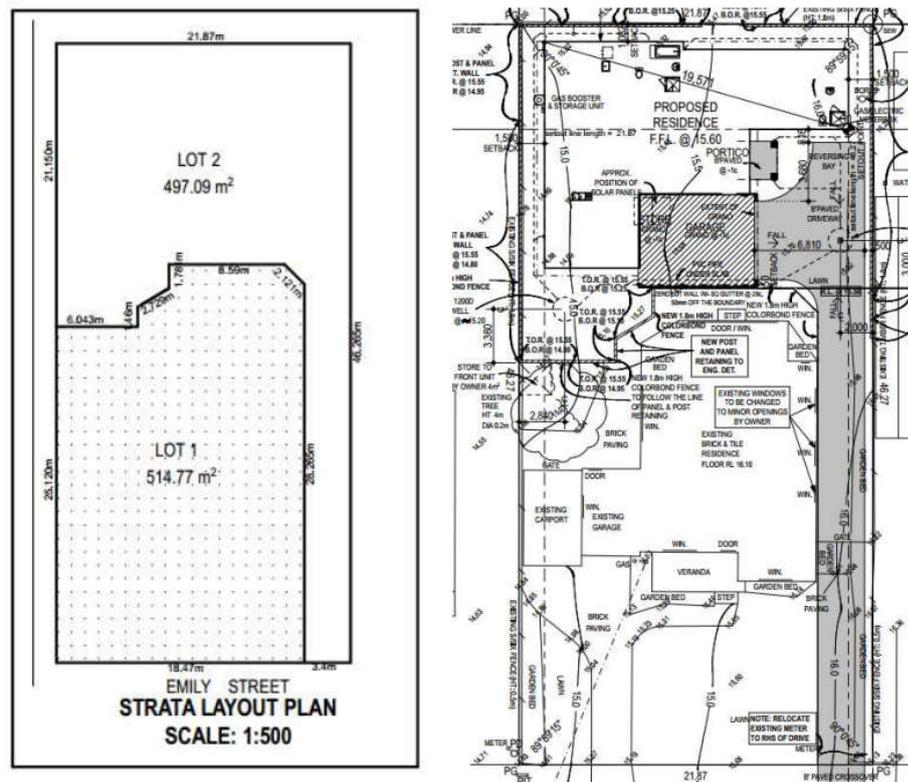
An irregular battleaxe subdivision layout as a result of wrapping the new lot around the retained dwelling while trying to meet the bare minimum land area required (source: author)
